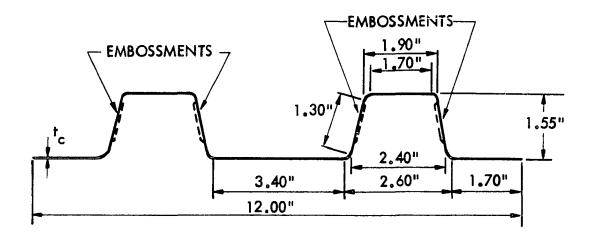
Typical profile of steel deck I (CATEGORY I)
